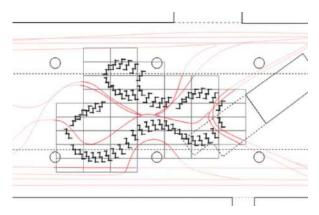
Pavilion space constructed through louvre walls that mediate privacy
